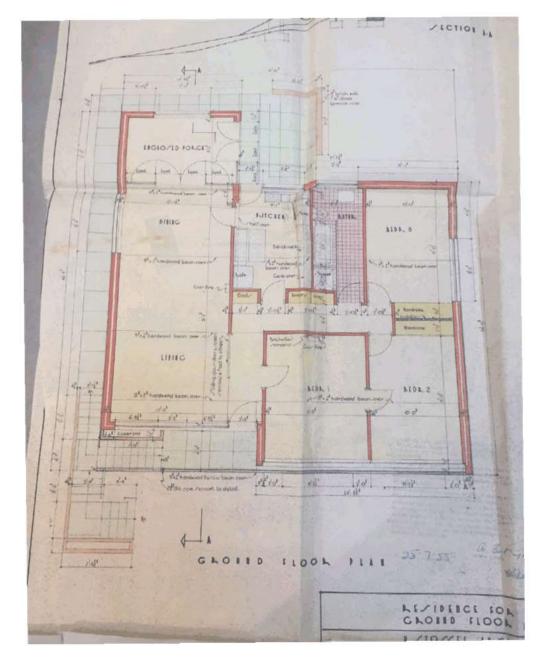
The original ground floor plan, 1955. WMC file 199/55
